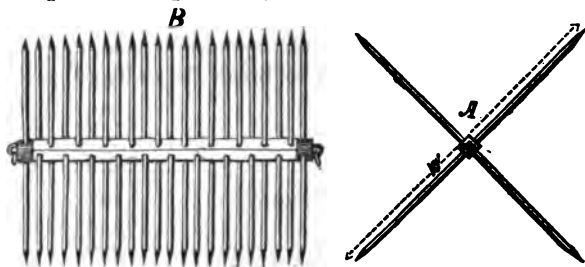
SECTION A AND ELEVATION B OF CHEVAL-DE-FRISE.
